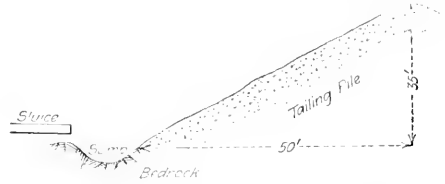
SECTION OF "BLOWN-UP" TAILINGS PILE
